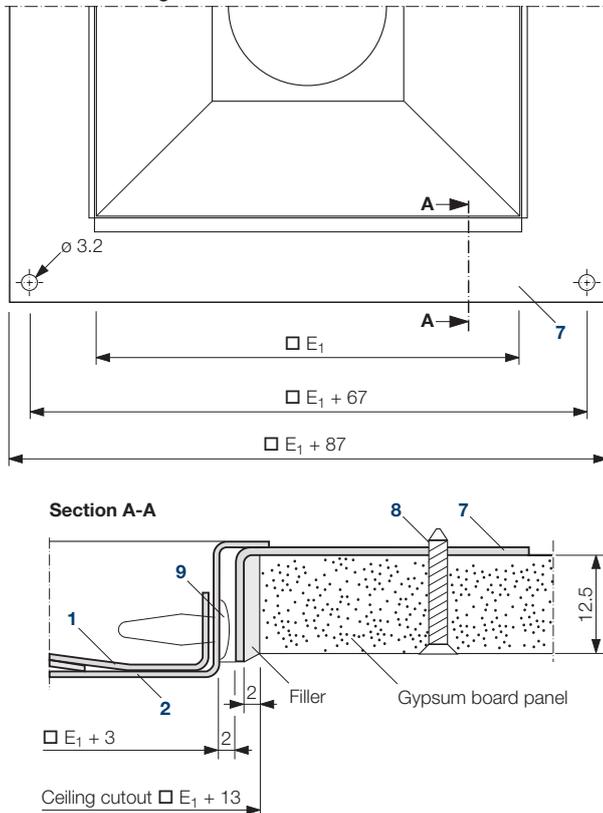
Detail OC-Q gypsum plasterboard ceiling installation frame
